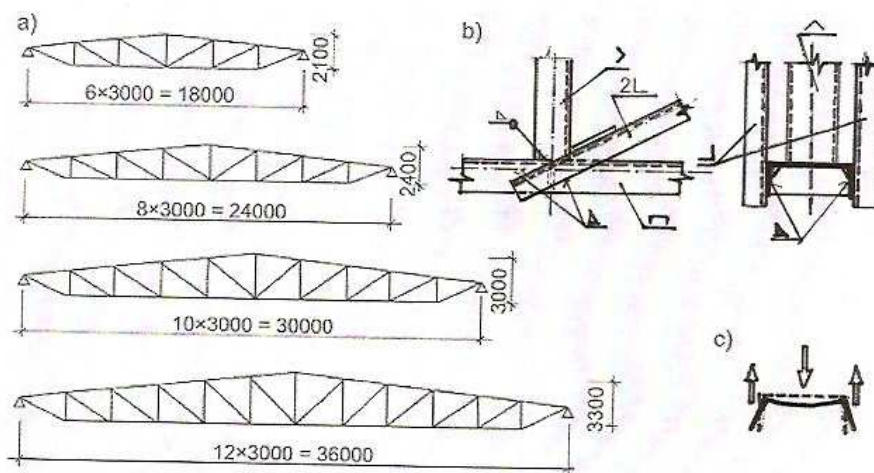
Typical truss rafters of N-shape, a) schemes, b) construction of a bottom joint, c) deformed cross-section of a bottom chord
